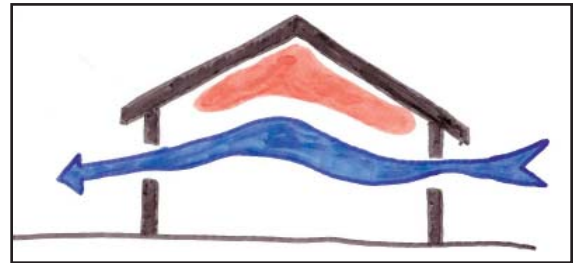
Cross ventilation without drop ceiling. Notice warm air rises away from occupants although still trapped inside.
